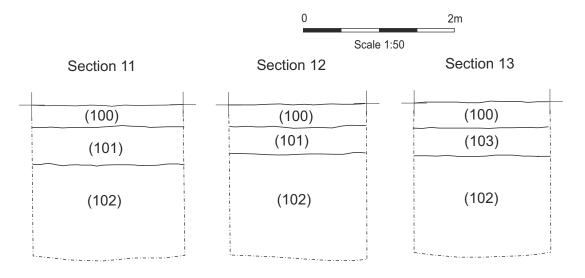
sections and location plan for soakaway pits 1, 2 and 3 (sections 11-13)
